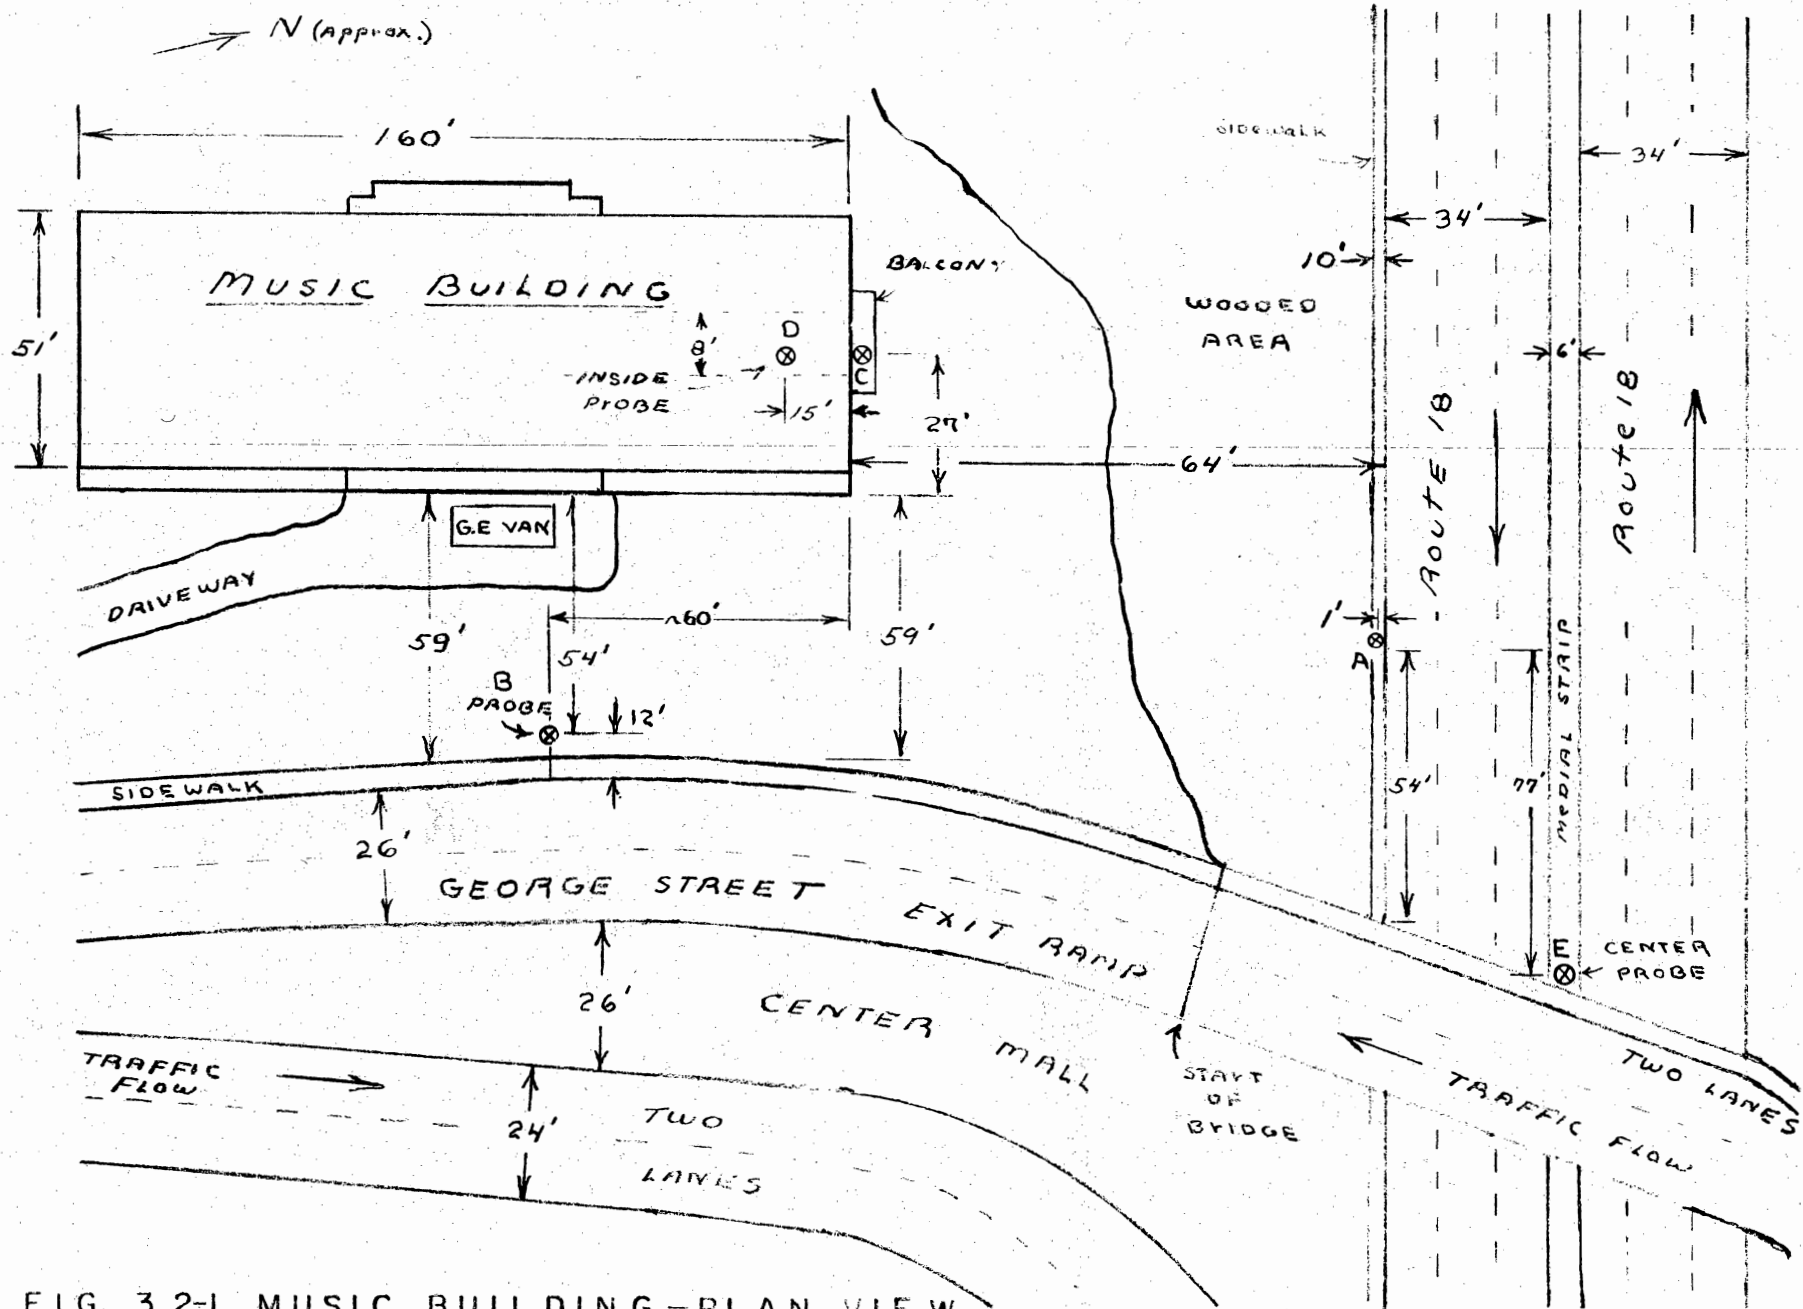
MUSIC BUILDING-PLAN VIEW
